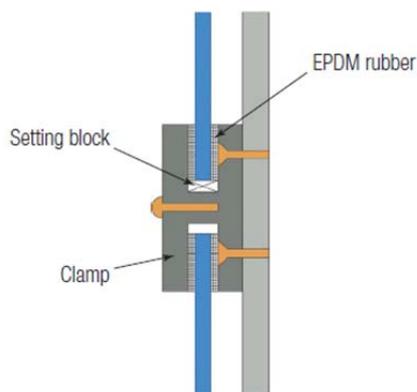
Section and facade using clamped connection (Structural use of glass in building)
